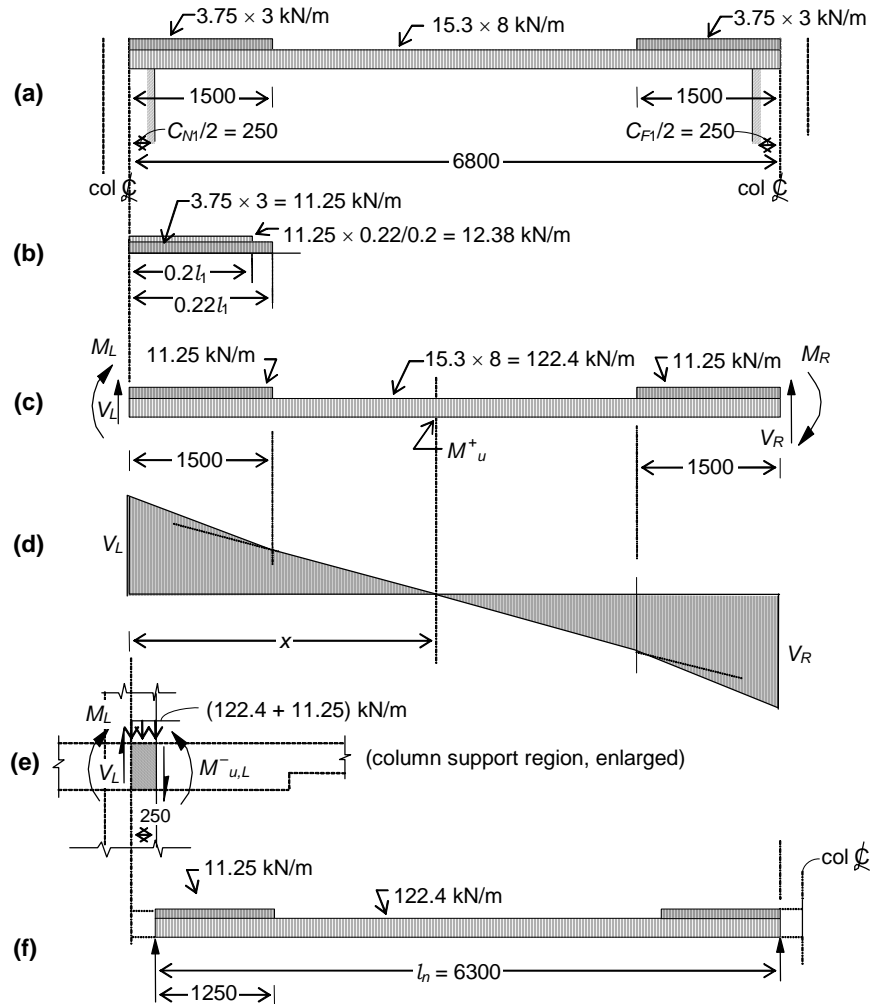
Loading details on slab-beam member — Example 11.7
